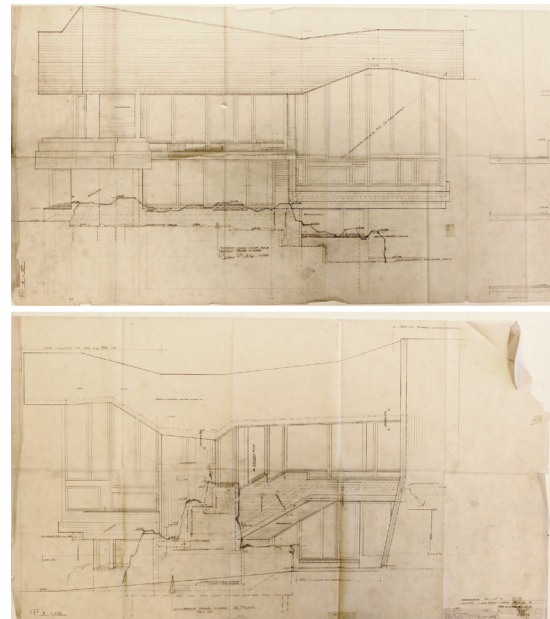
Southeast corner elevations, 1966. Suomen rakennustaiteen museo - Museum of Finnish Architecture – MFA
